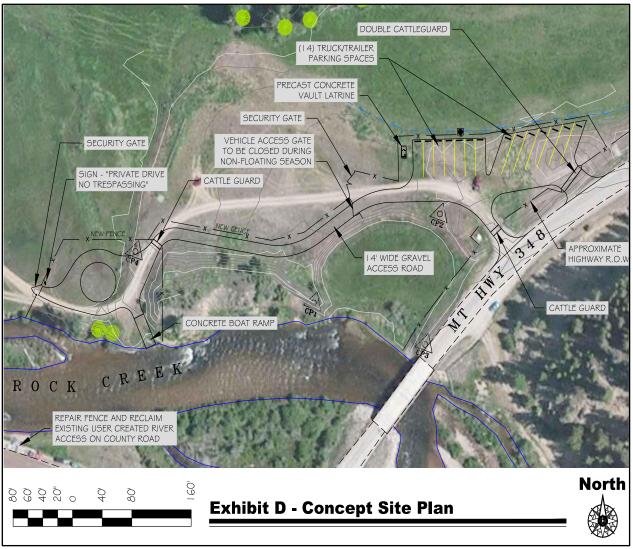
Preliminary Concept Site Plan for Westslope FAS.
